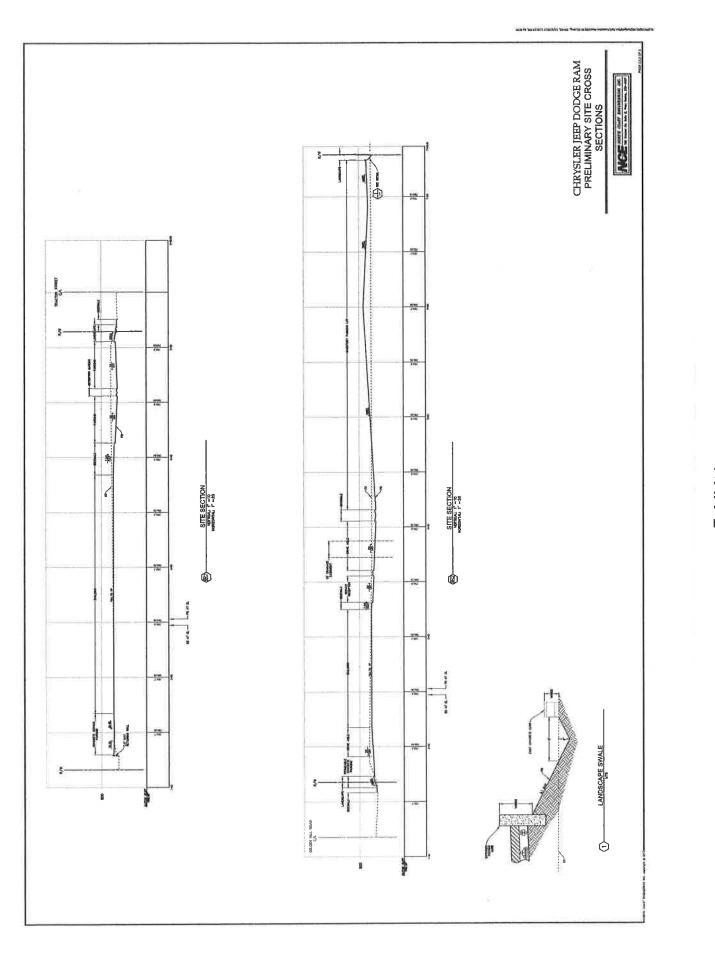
Exhibit H Preliminary Grading & Drainage Plan PD 13-006 & CUP 13-008 (Mullahey Chrysler)
